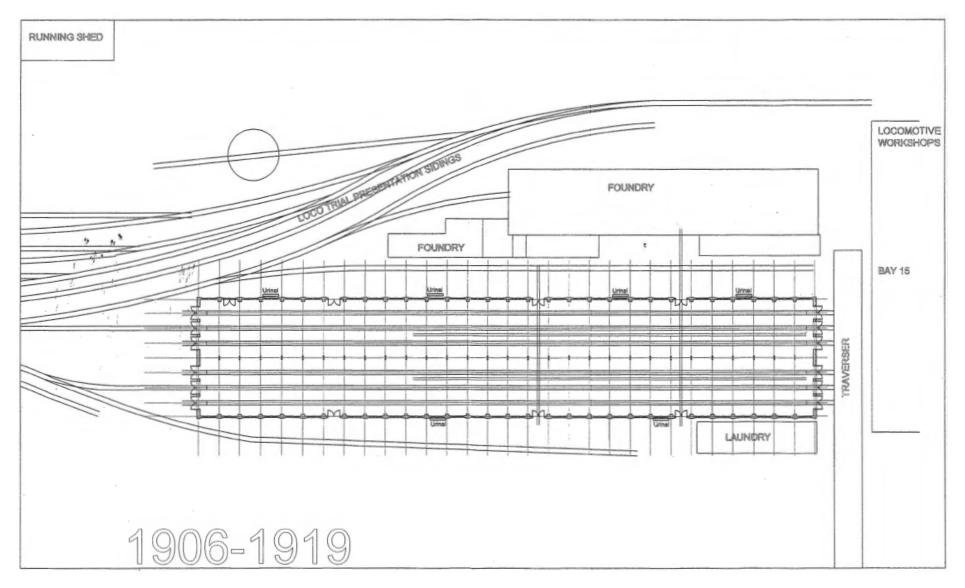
Site Development Plan for LES in 1906-1919 (Simpson Dawbin Architects 2003, CMP, p.32)
